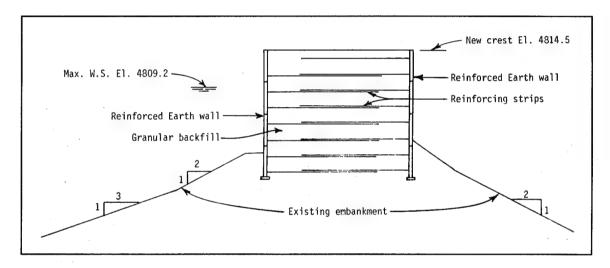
Cross section of Reinforced Earth retaining wall system, Lake Sherburne Dam
